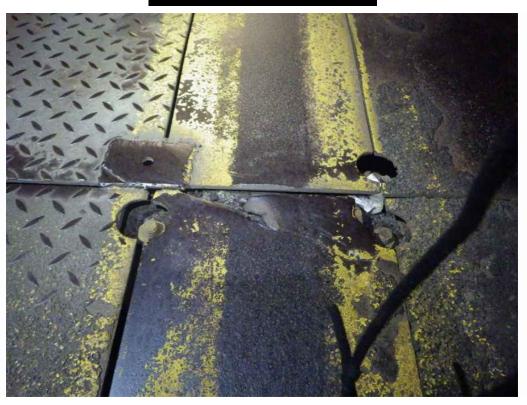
Span 5, Roadway Deck Panel South of T16, 6th Panel (Middle Panel) from East Curb, Looking North - Gouge at corner.
